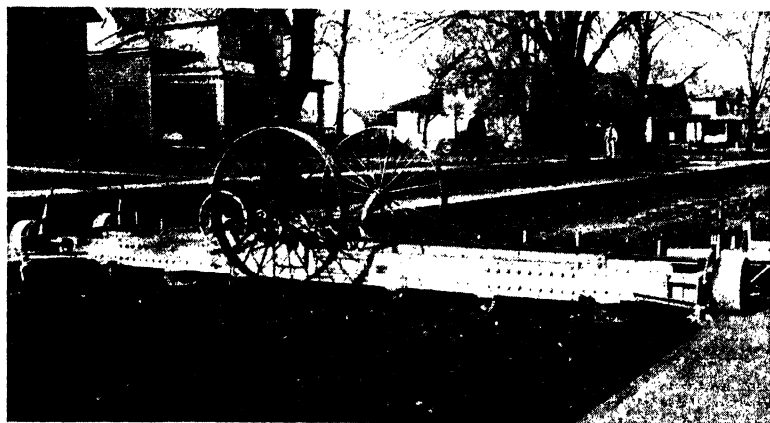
A subgrader at work between the two side sections of a concrete pavement already placed on a city street.
